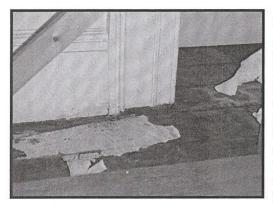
Southwest second-story collections storage room has experienced damage to both its ceiling and floor along the west well. This image illustrates damage caused when water penetrated the room's floor after having saturated over fifteen feet of masonry wall. Damage incurred included damage to (1) historic coverlet, which had been stored on rack in foreground and discoloration of wood trim and floorboards. Left untreated, original historic wood trim will continue to decay and mold growth will accelerate.
